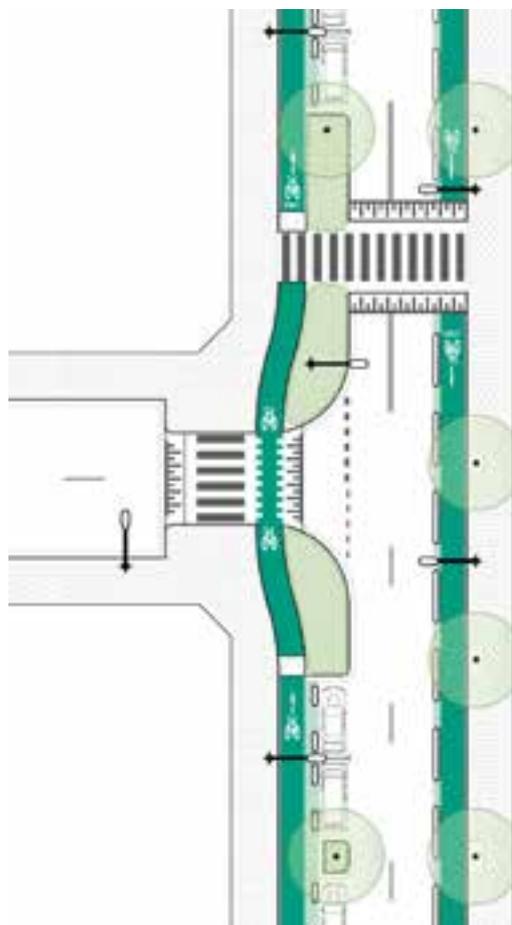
Bicycle path (one-way), bent-out intersection - plan
